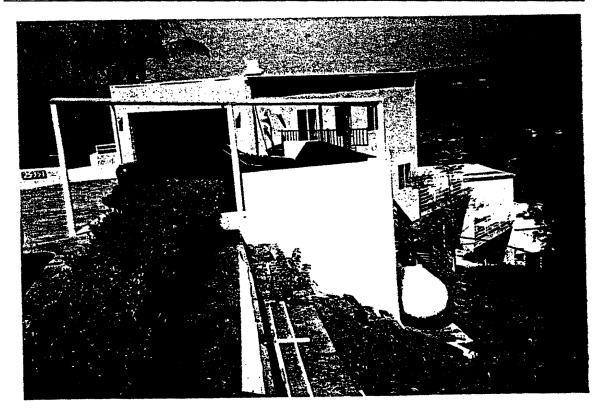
Looking west at retaining wall, carport, propane tank with concrete pad, irrigation system. chain link fence and house on March 15. 2001.
